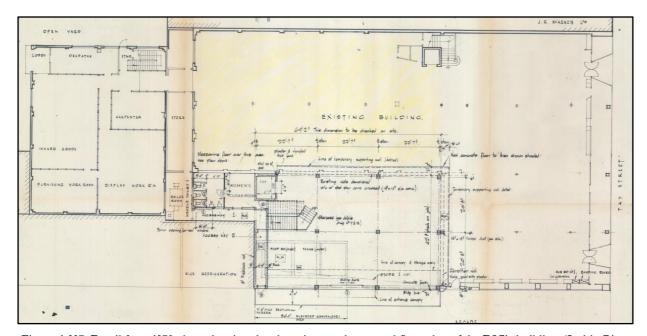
Detail from 1970 plans showing the alterations to the ground floor plan of the DIC's building (Smith, Rice, Lawrence, & Mollison, 1970).
